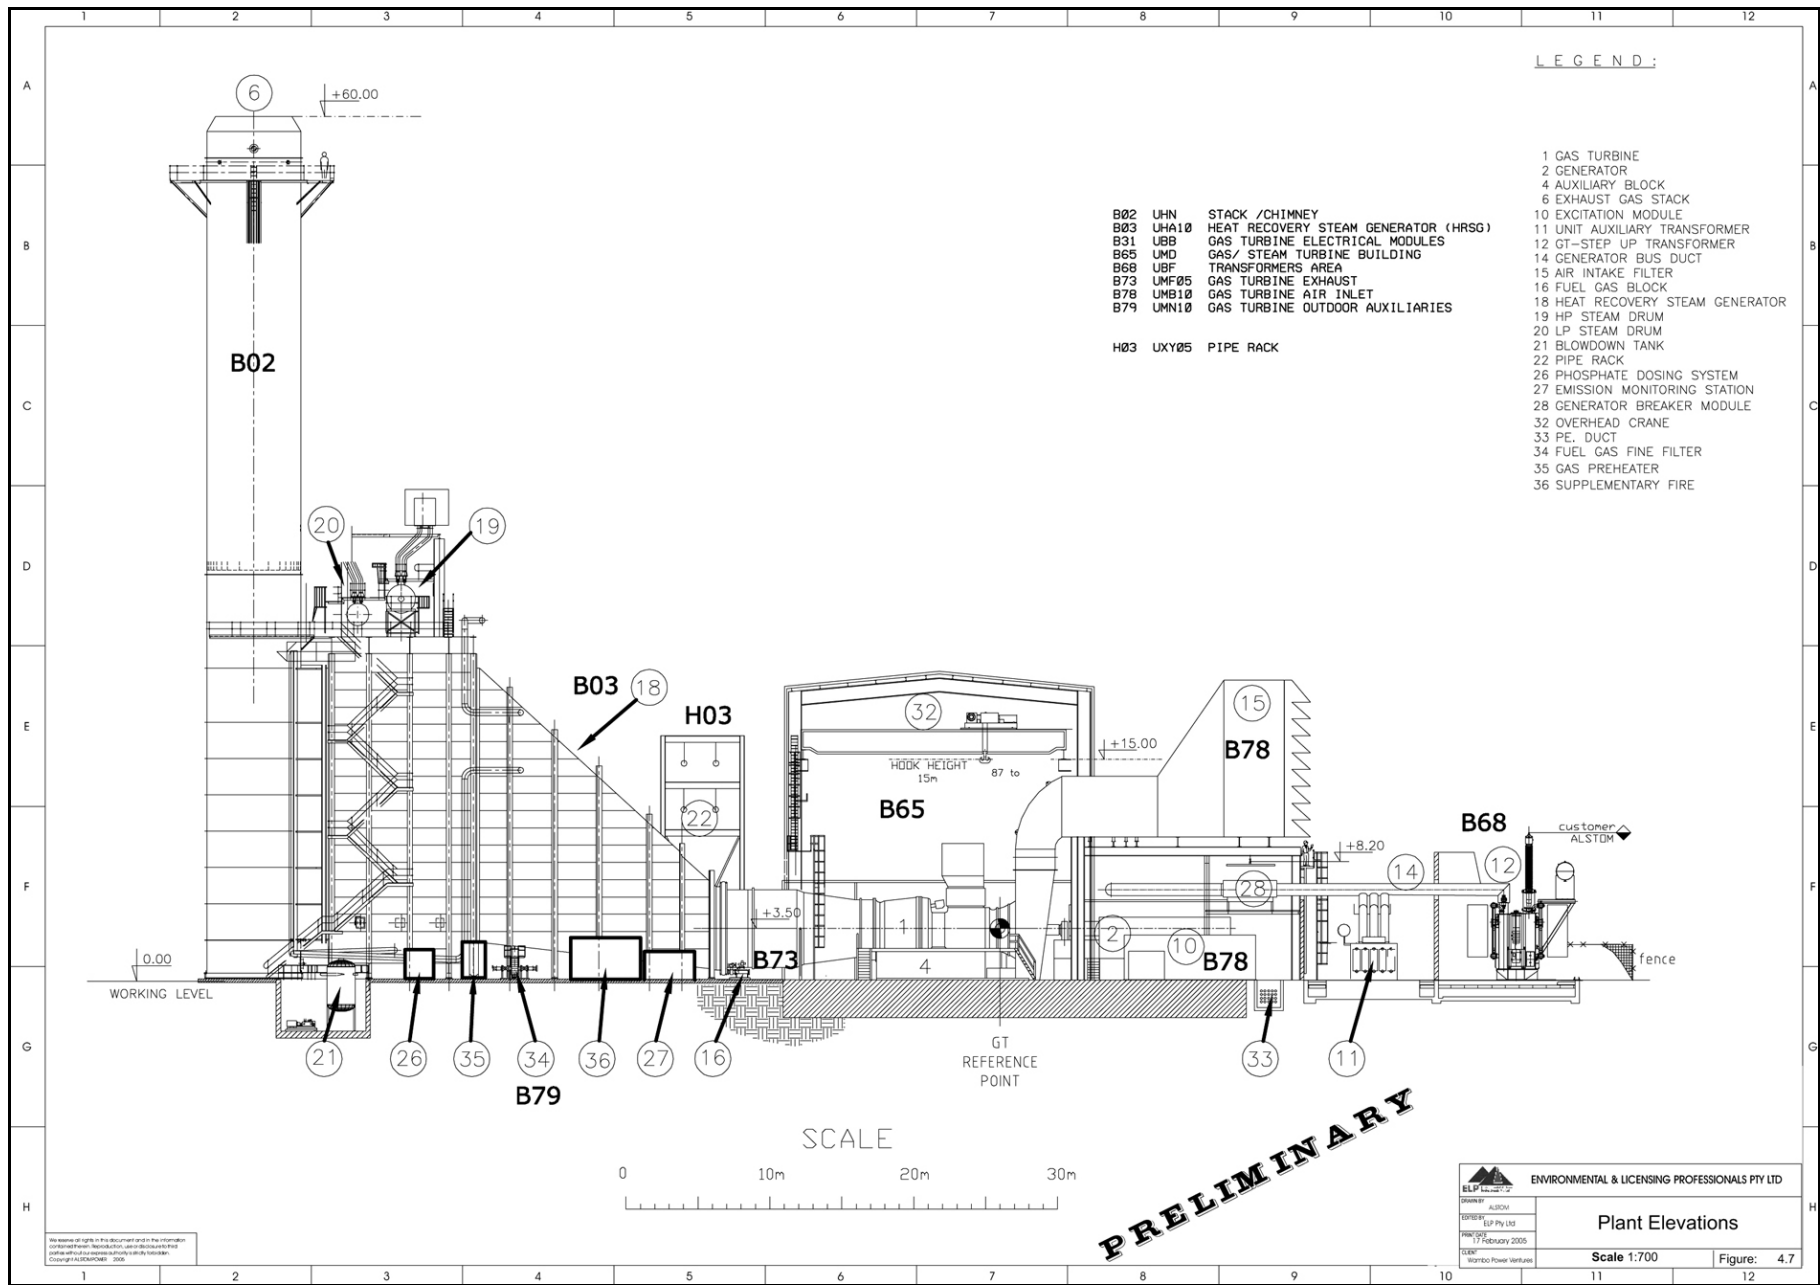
Proposed Kwinana Gas-Fired Power Station plant elevations
